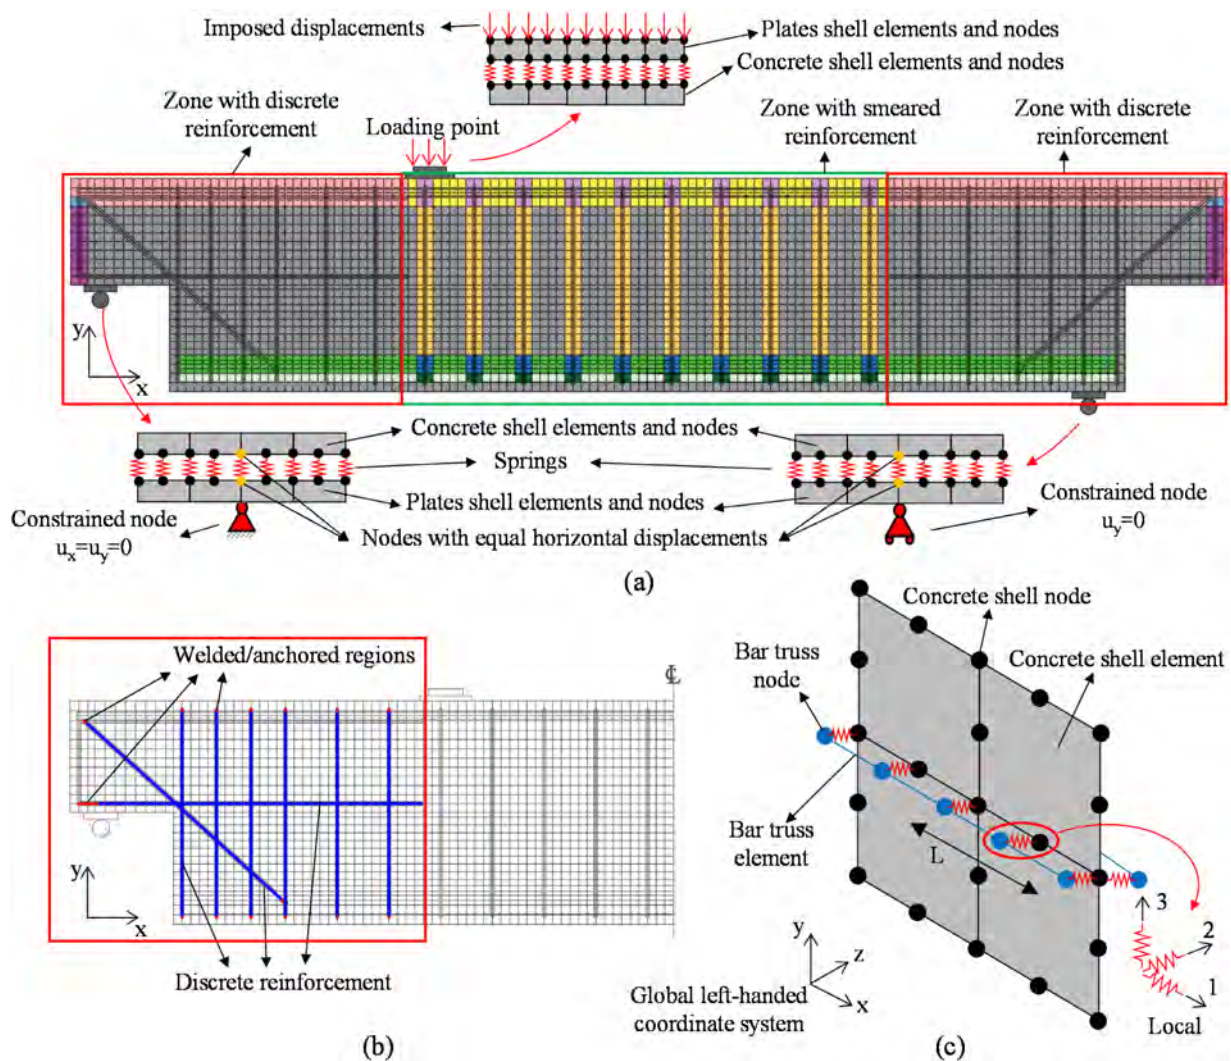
(a) Smeared and discrete FE modeling zones, (b) detail of reinforcement modeled with discrete approach, and (c) detail of the interaction between discrete reinforcement and concrete elements. FE, finite element.
